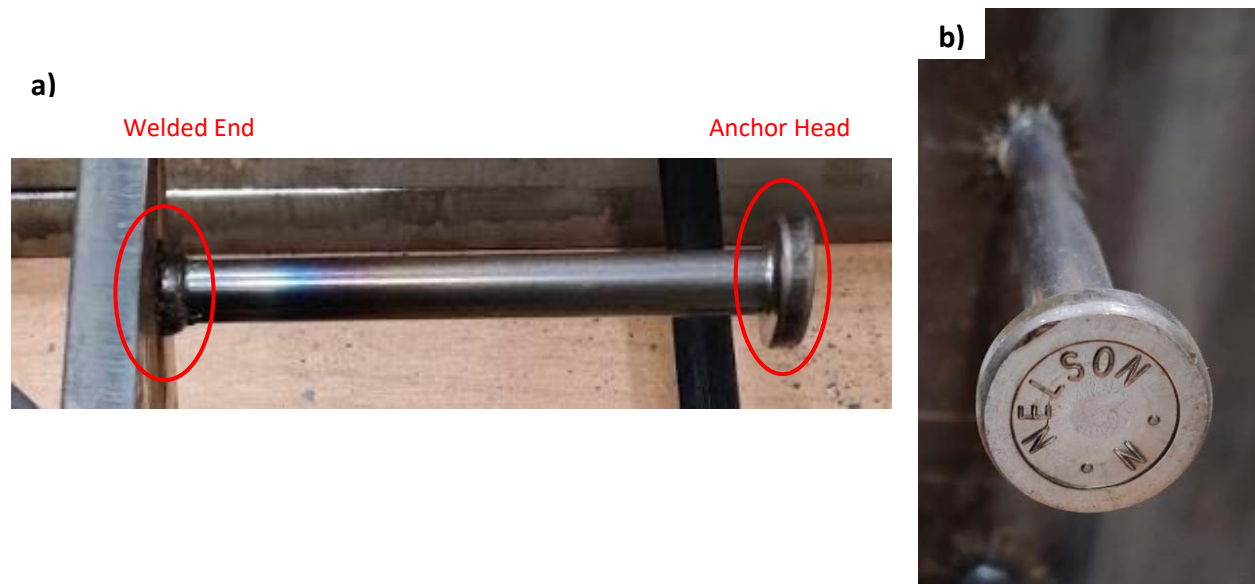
Anchor welded to a steel plate (a) viewed from the side, and (b) viewed from the anchor head
